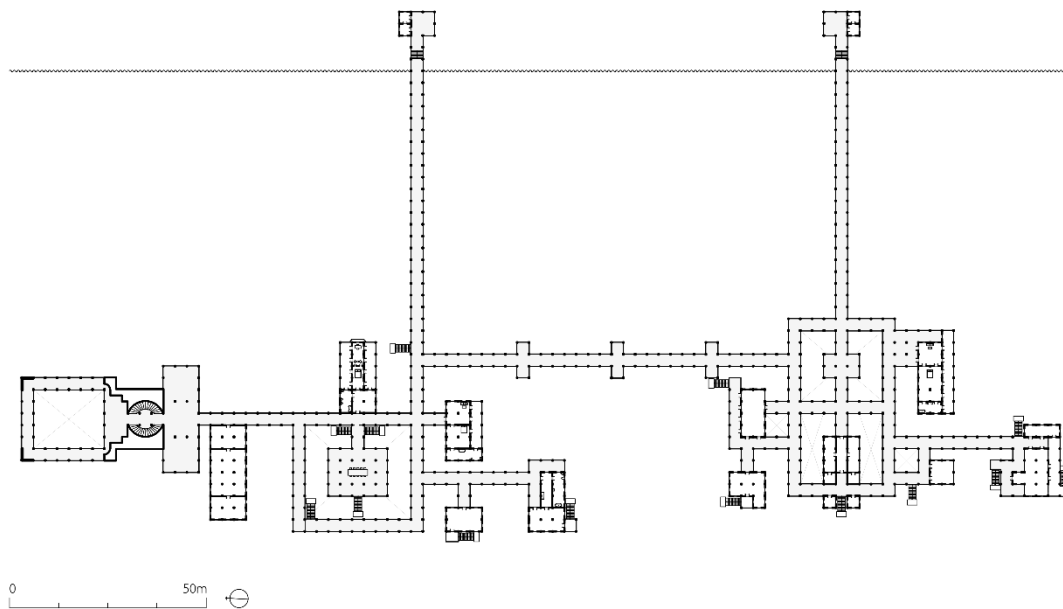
Mrigadayavan Palace, plan. The intricacy of the building's plan is remarkable when compared to the simplicity of its section. Its corridors are arranged like winding garden paths, lifted very simply off the ground. (Source: Plan drawn by Witinan Watanasap).
